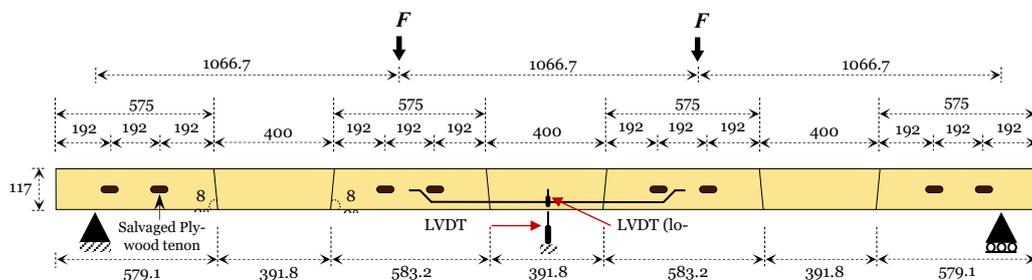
Dimension of the salvaged timber elements in the large-scale DLT panels and the four-point bending test set-up. Dimensions in mm.
